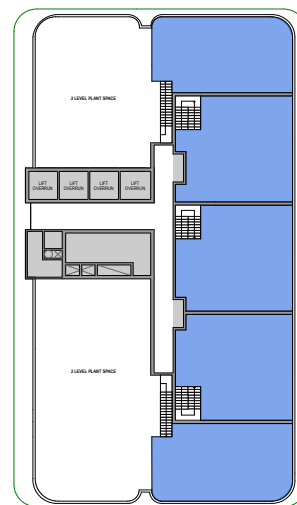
Concept Plan Penthouse Mezzanine L38mezz
